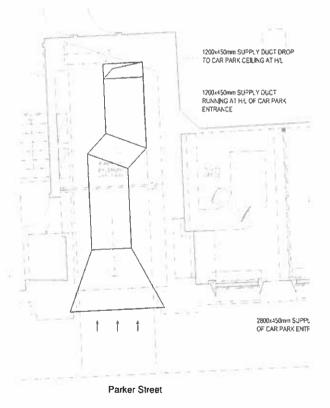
Design location of AHU02 (extract from SGA drawing U[10]-002)
